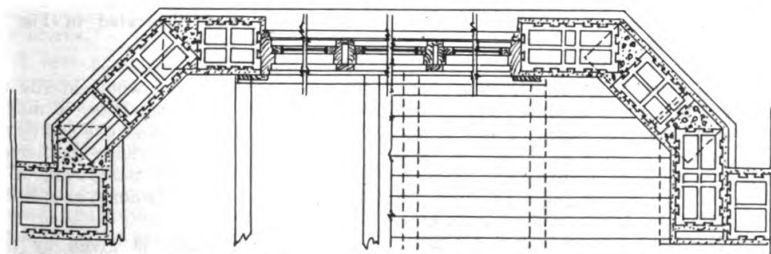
Method of constructing an oriel window. The spaces between the tile are filled with concrete, which forms a good bond.
